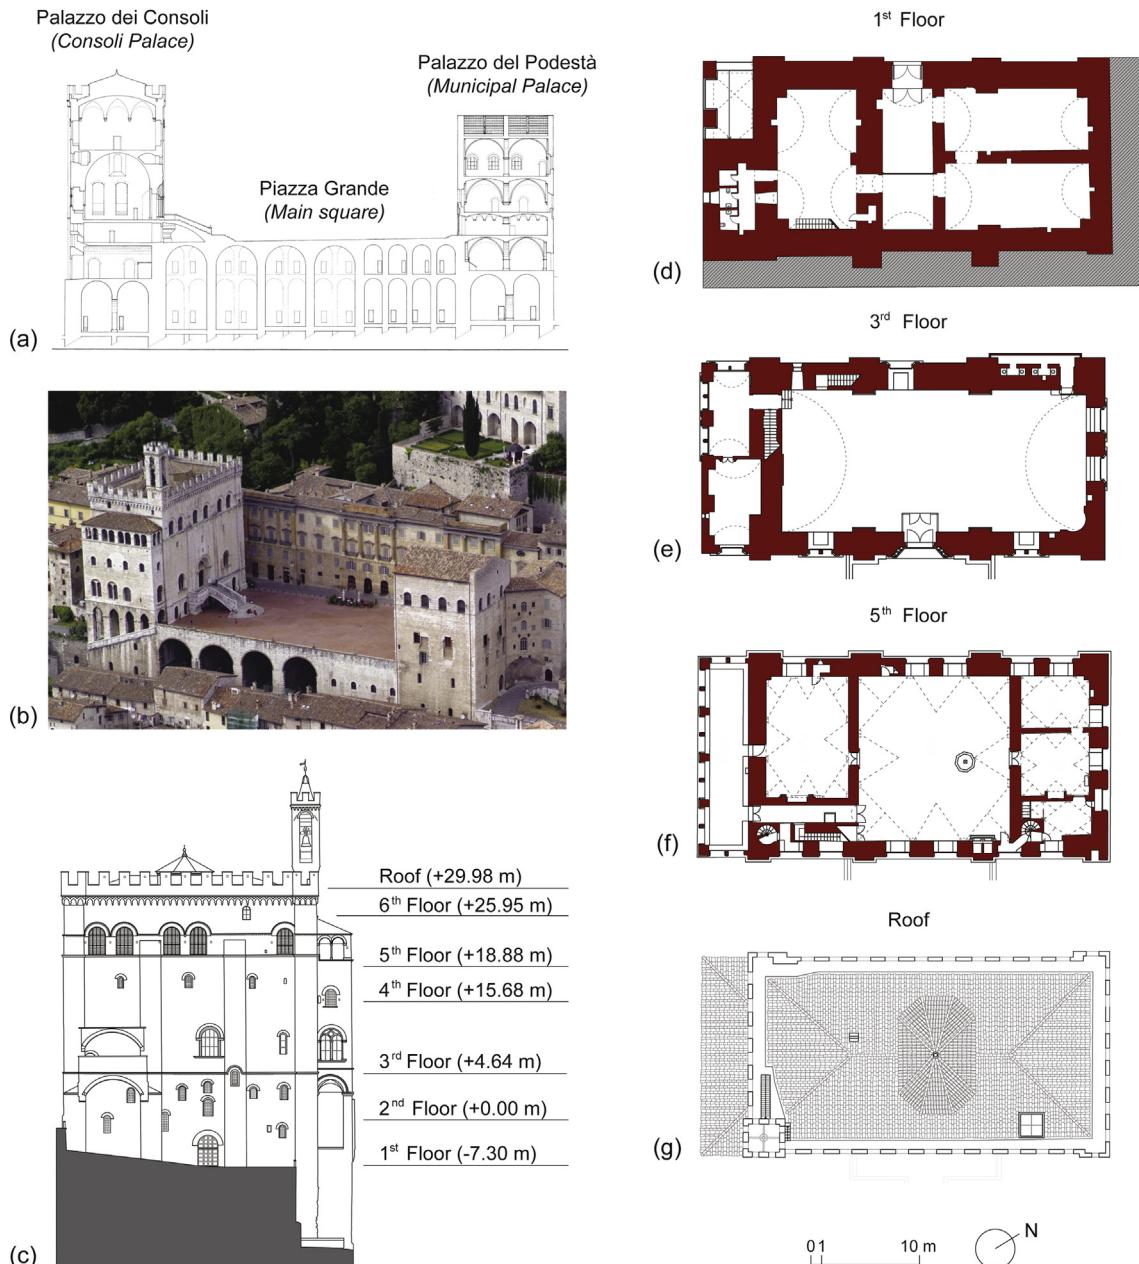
Longitudinal section (a) and aerial view (b) of the Medieval monumental complex of Gubbio consisting of Consoli Palace, the Main Square and the Municipal Palace. (c) Elevation of the West façade. (d-g) Plans of the main internal floors.
